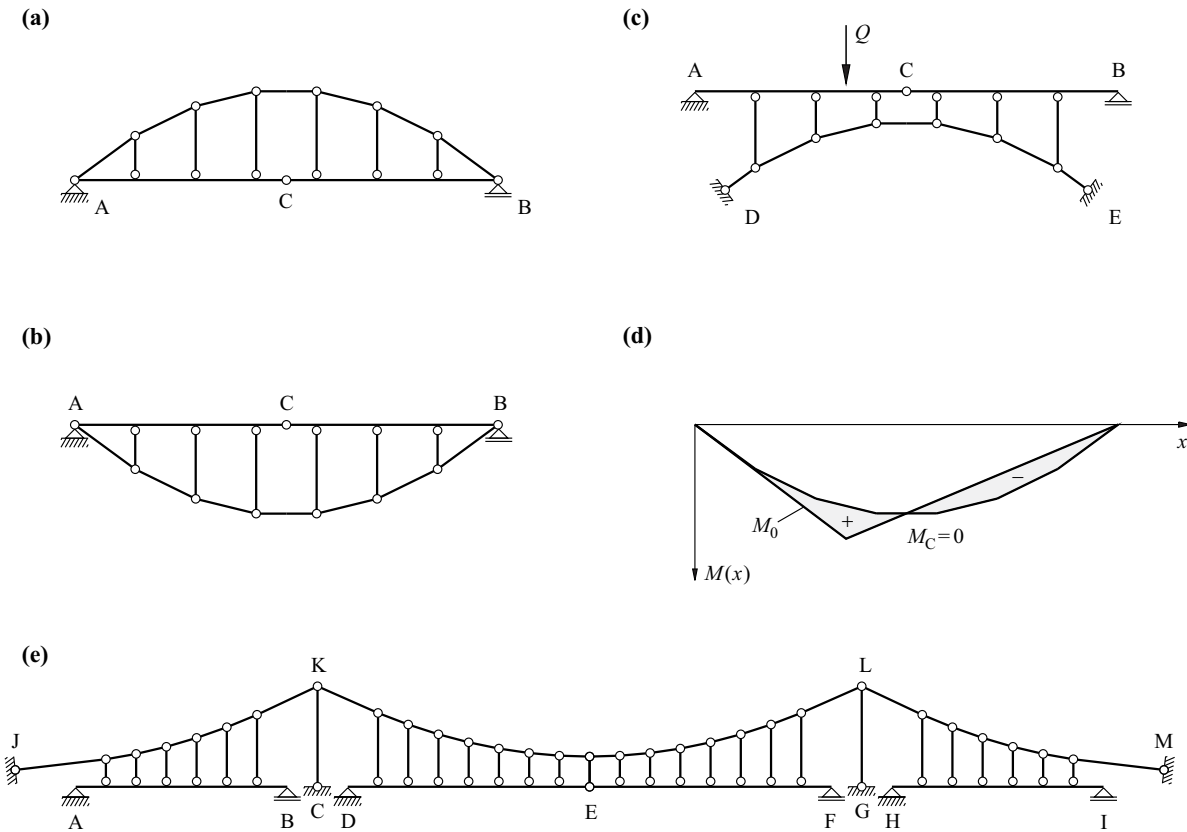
Stiffened beams with intermediate hinges: (a) LANGER beam (arch-hanger-girder system), (b) underslung beam, (c) deck-stiffened polygonal arch, (d) bending moment diagram due to point load Q on deck-stiffened polygonal arch, (e) suspension bridge
